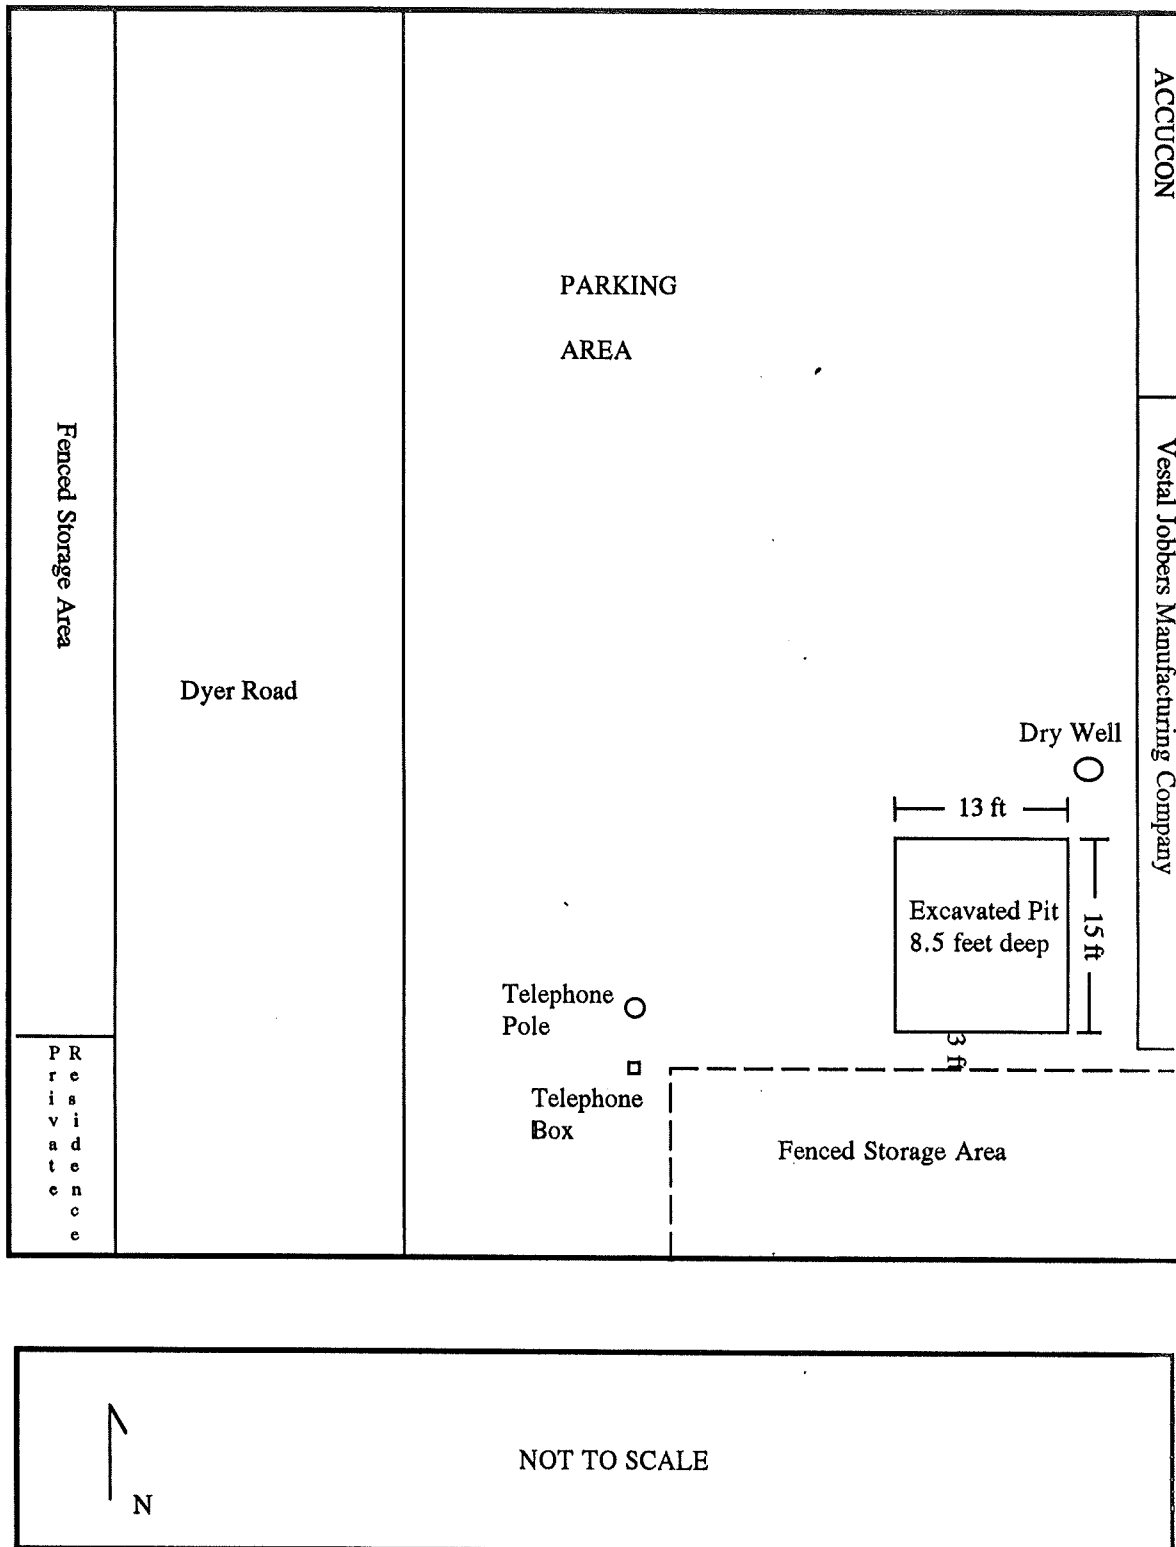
Site plan showing locations of excavation pit in relation to the building.
